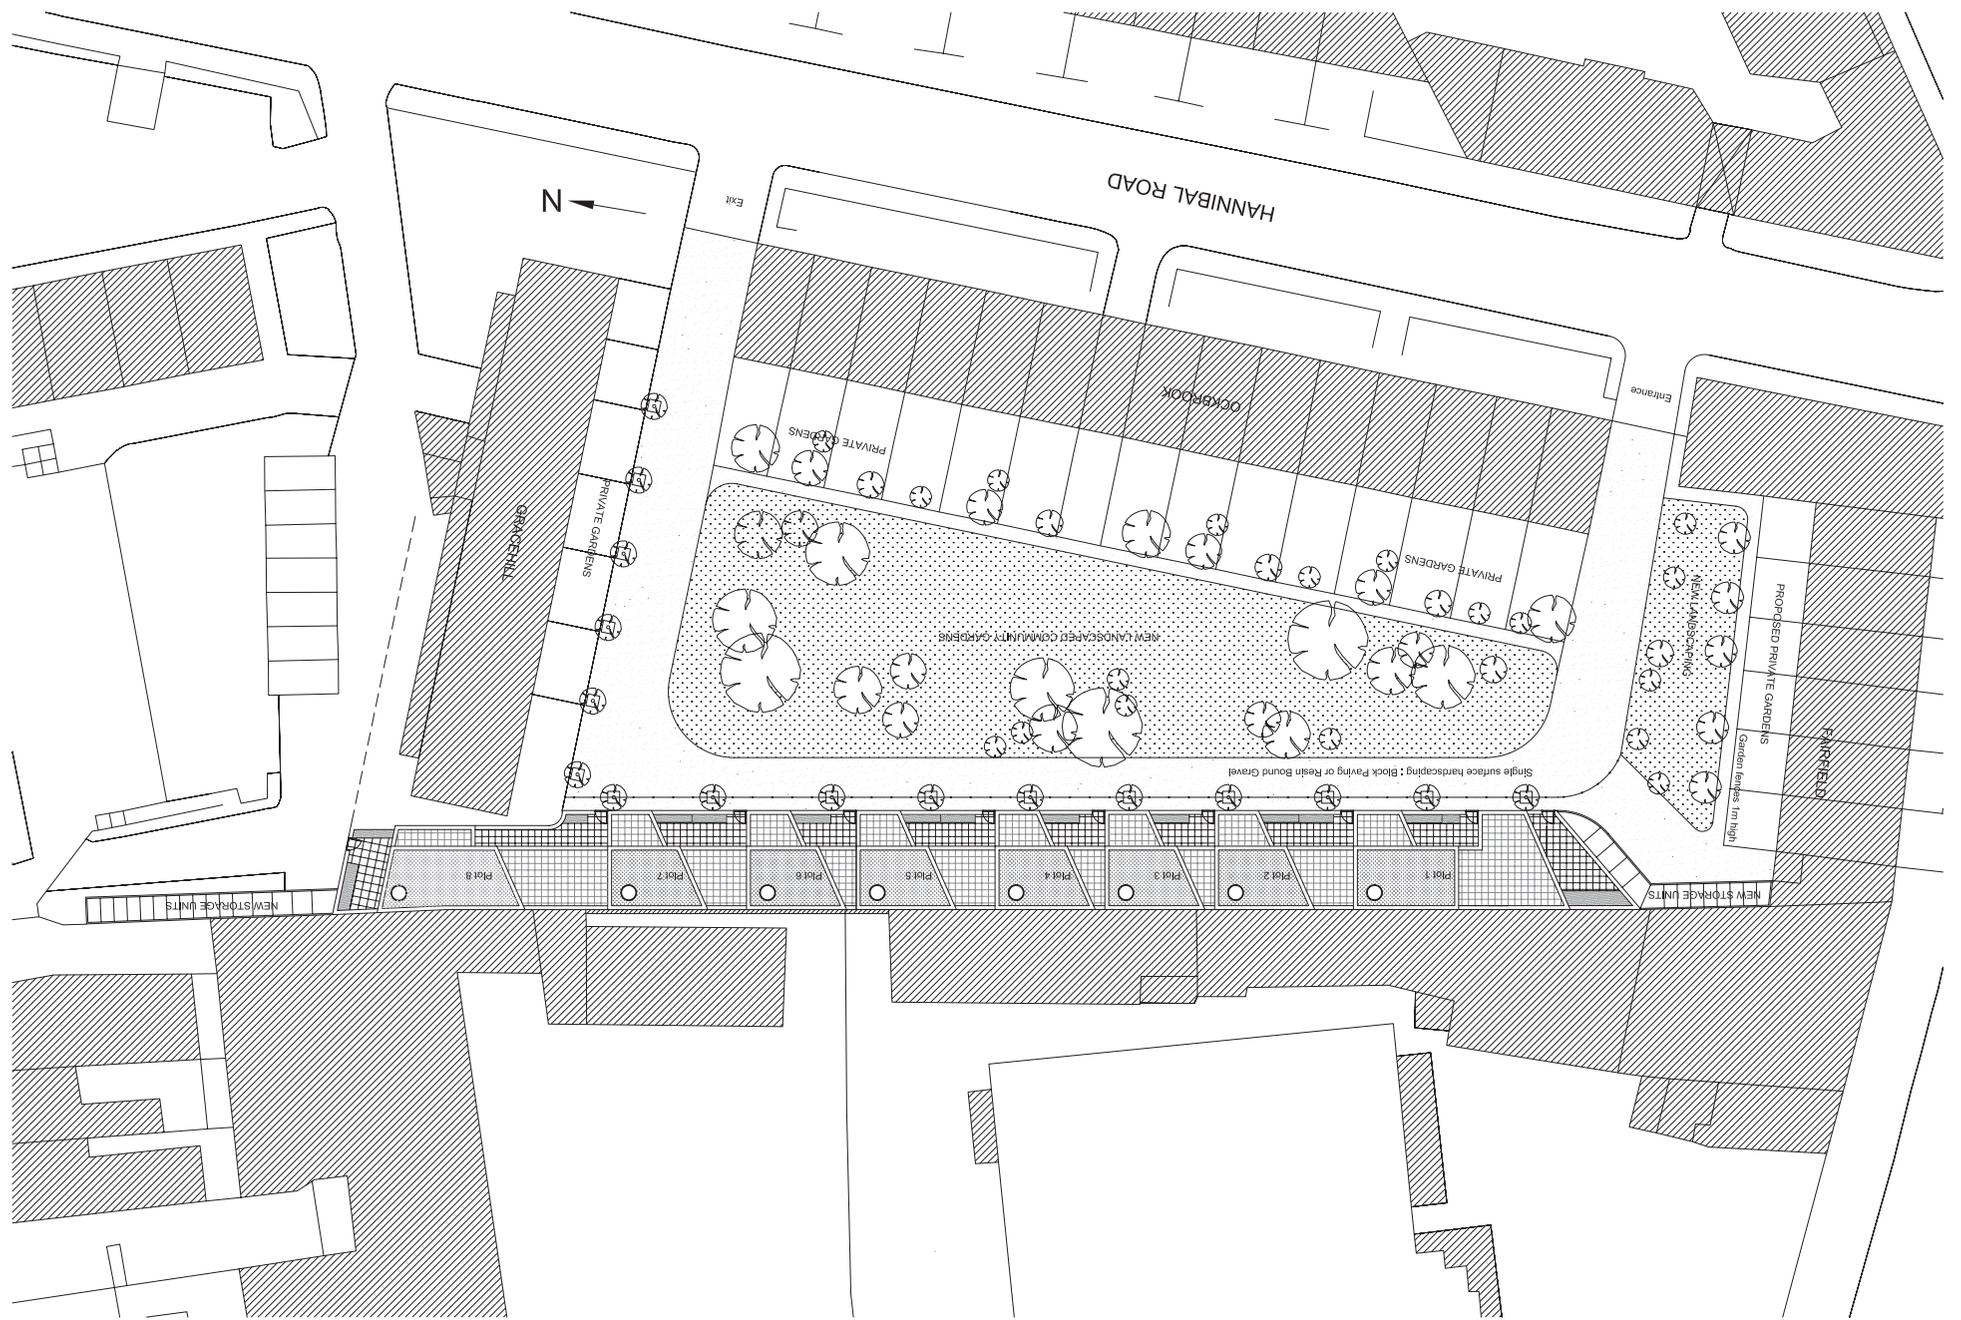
Hannibal Road Gardens: Site Plan 2.
